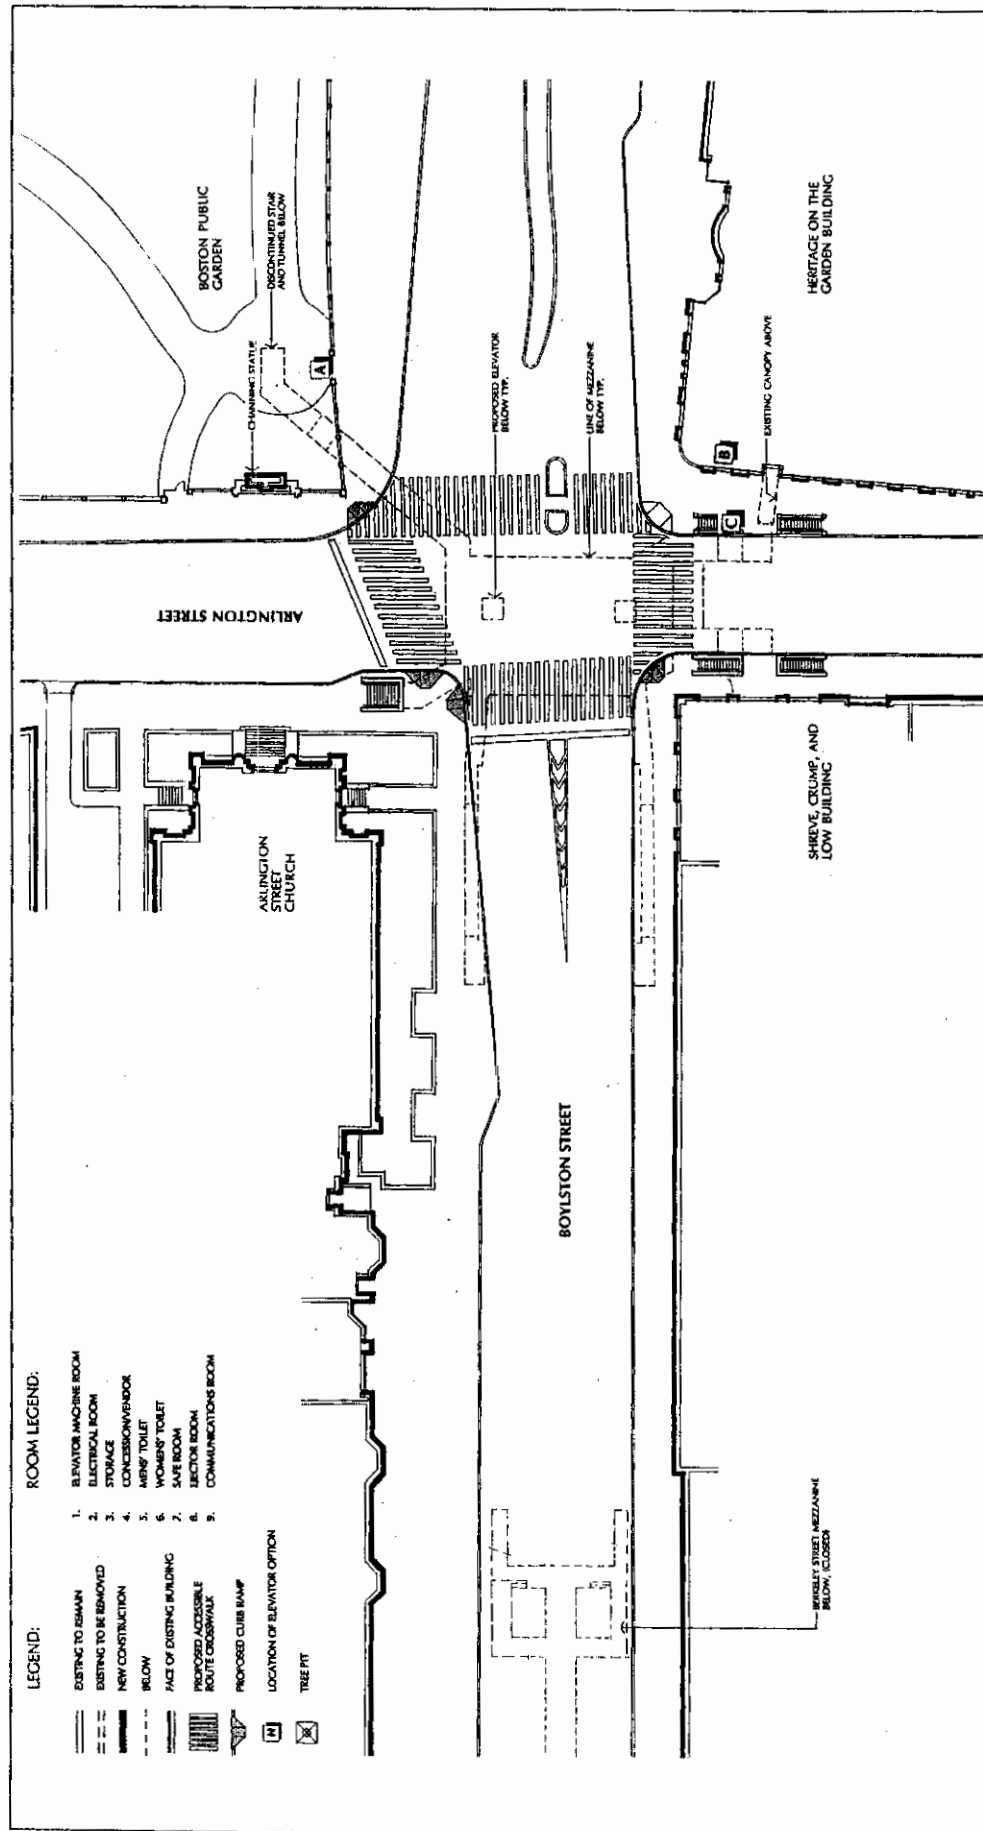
Arlington Station, Street plan Scale: 1"=40'
